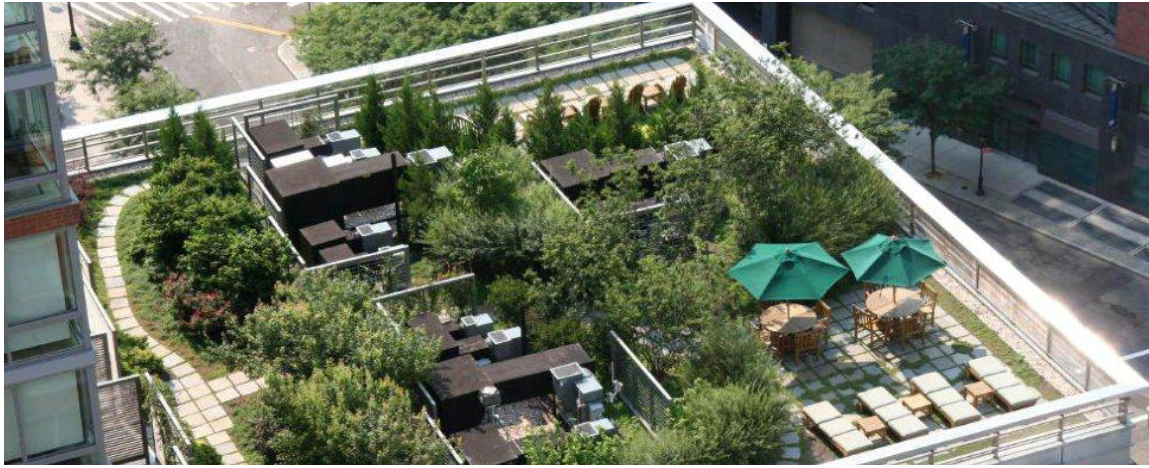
The green roof on The Verdesian, a residential building in lower Manhattan, provides dedicated space for access, passive recreation and the building's mechanical equipment.
